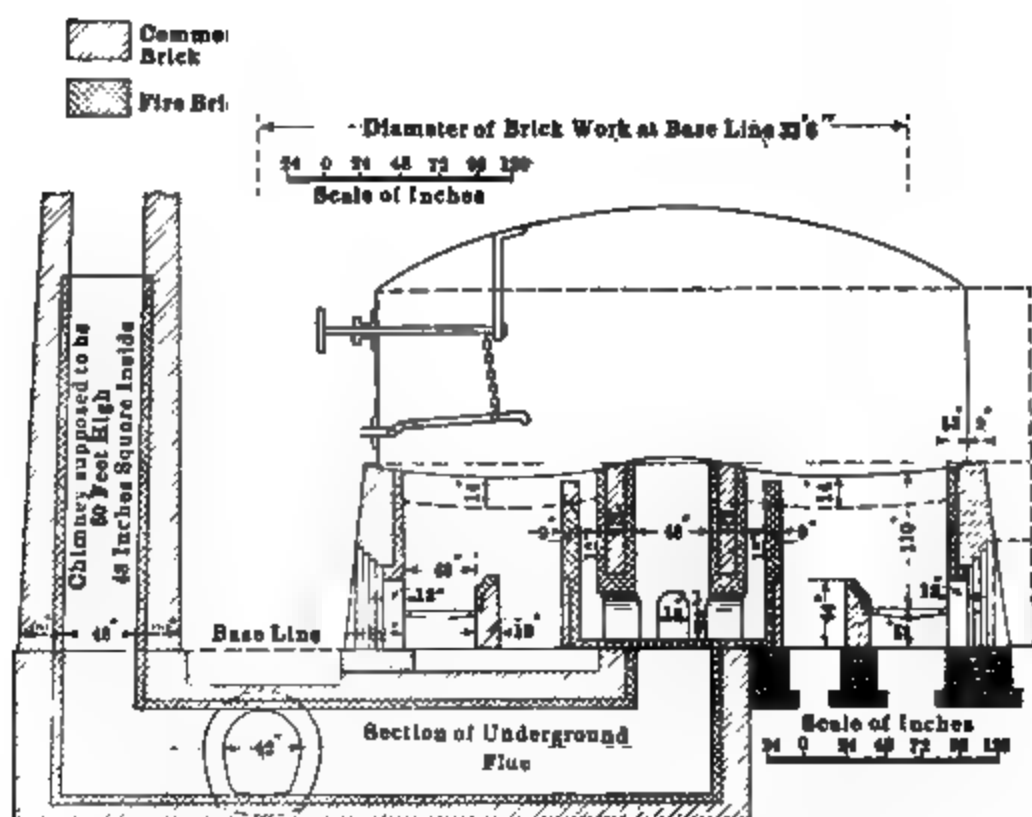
Method of setting "cheese-box" stills over a furnace.
